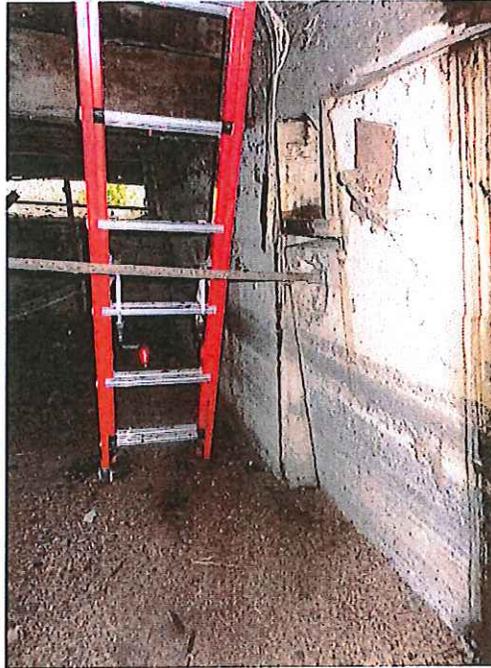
Broken grade-beam showing 16 degree and 5 degree rotation
